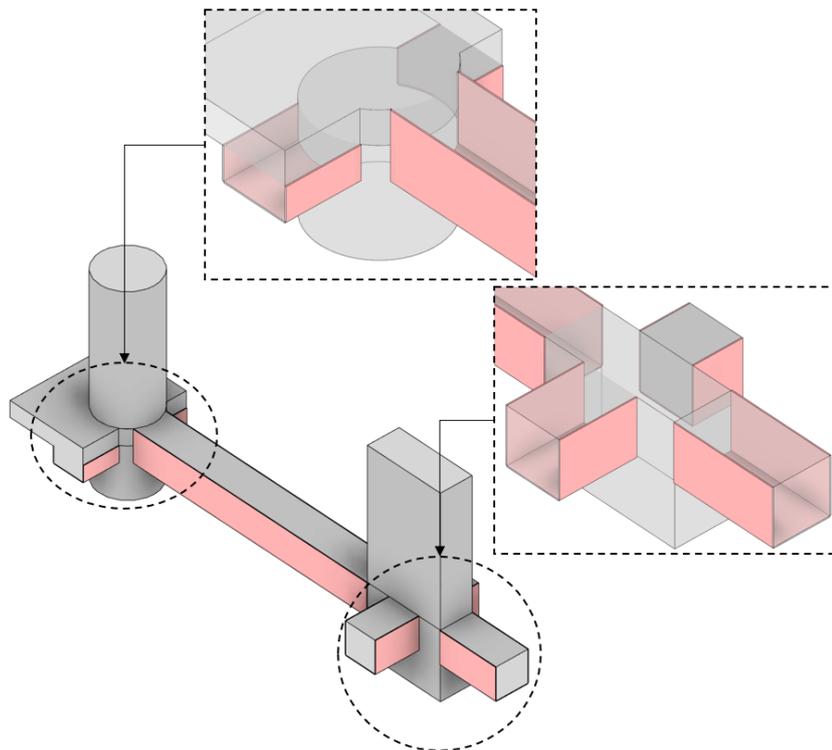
Typical beam, column, and floor connections calculated and modeled correctly
